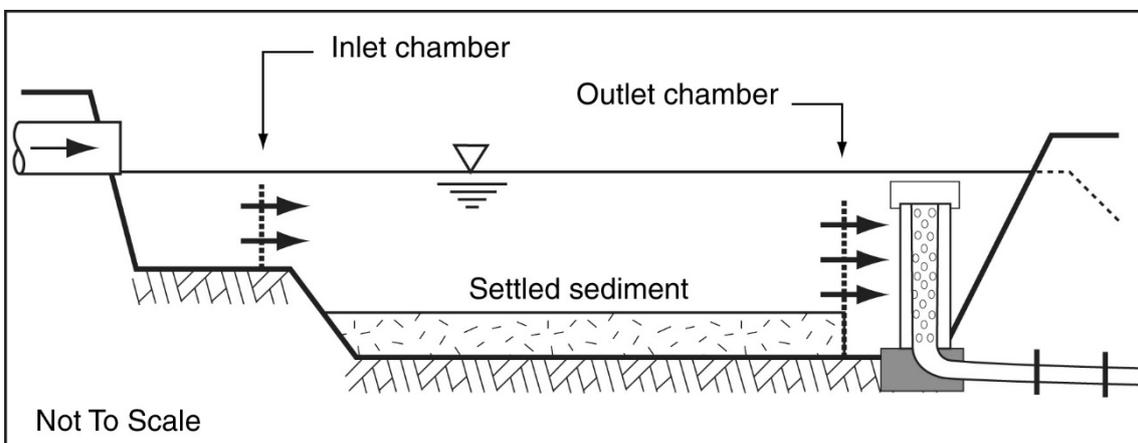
Typical arrangement of an inlet and outlet chamber (long-section)
